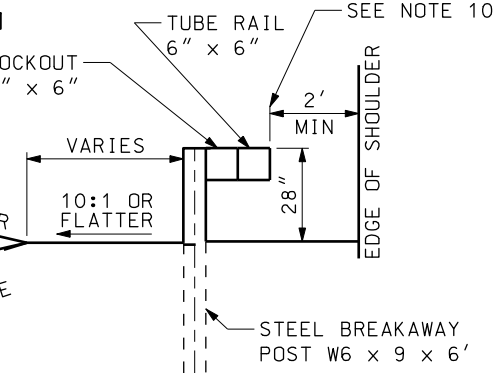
DETAIL WHEN SYSTEM IS INSTALLED WITH CONSTANT SLOPE BARRIER
